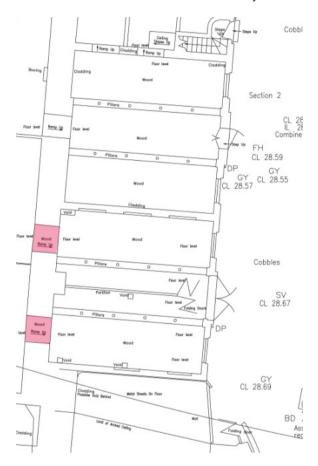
Previous survey of Tack Room ground floor showing west elevation openings in red.
